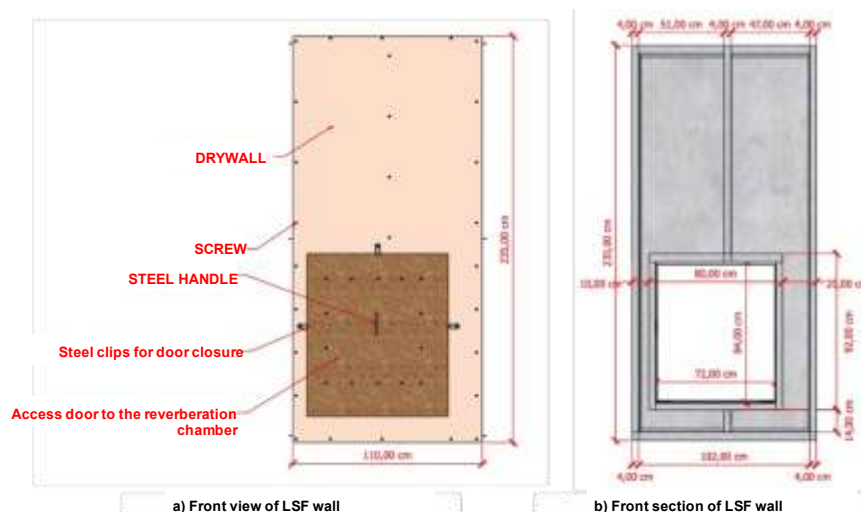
Front view schematic drawing of the test wall. a) frontal view; b) front cut.
